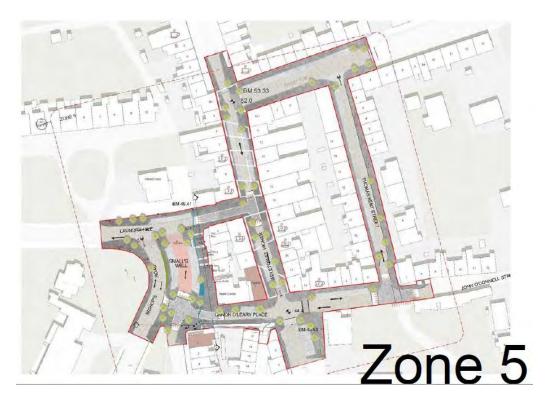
Proposed Zone 5 development - Laundry Hill and Surrounds
